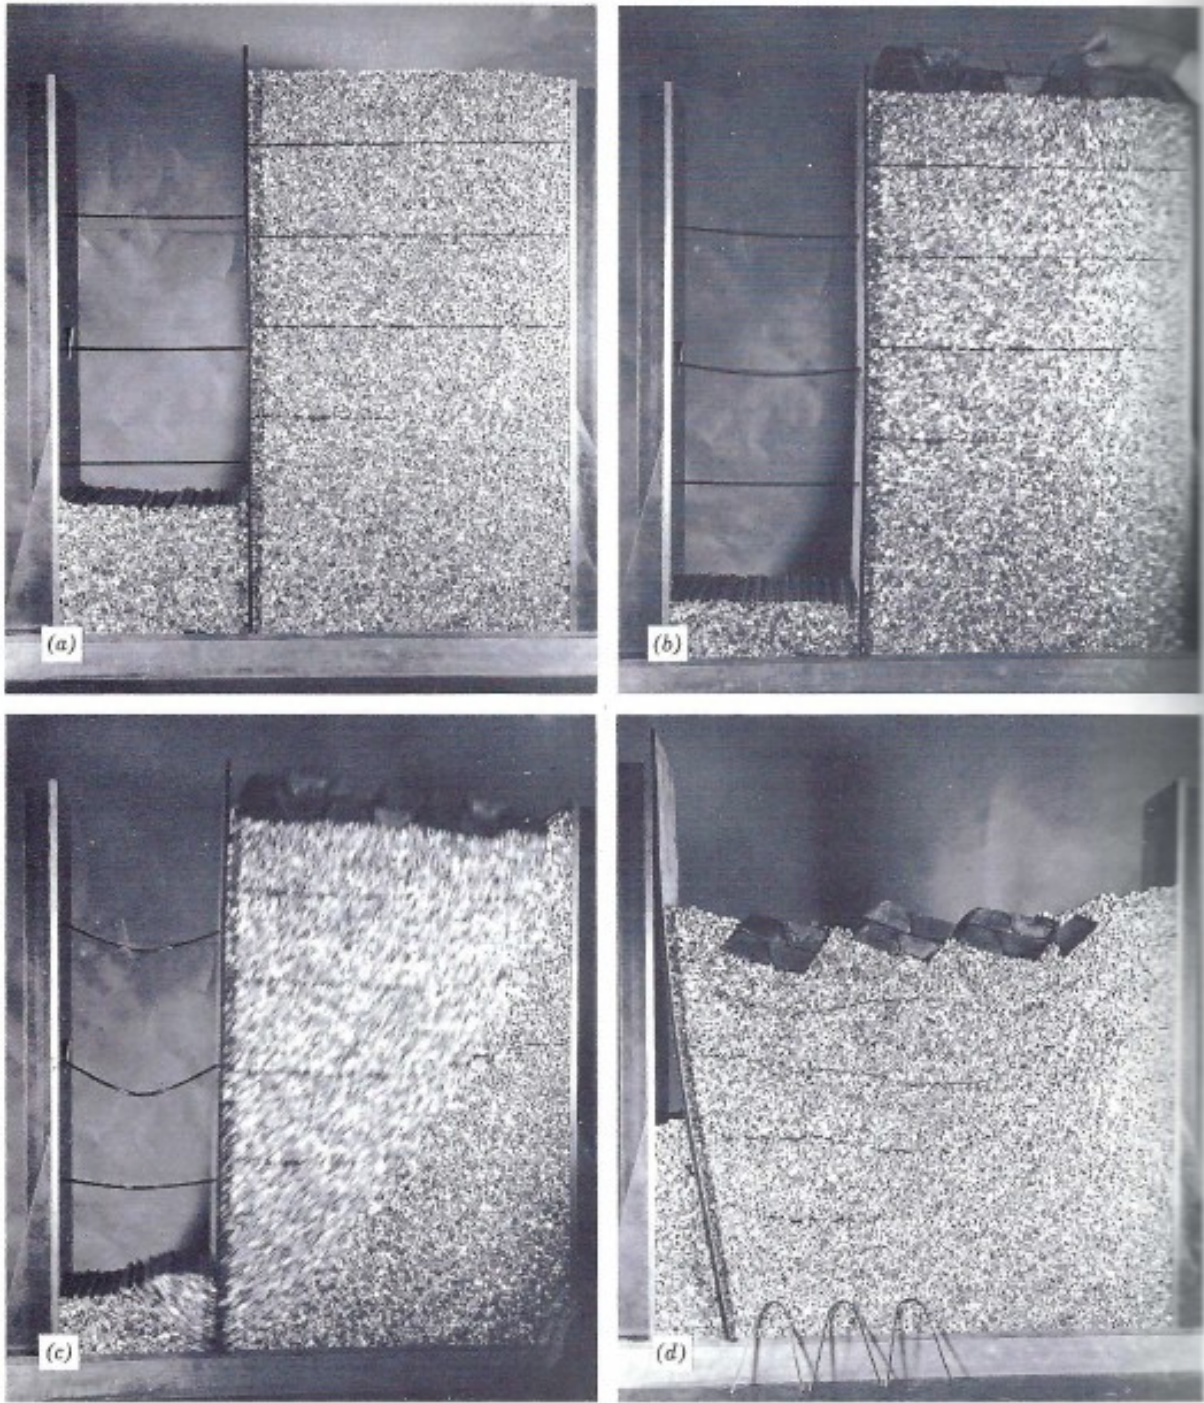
Failure of model of braced excavation. (a) Stable. (b) About to fail. (c) Failing; note motions. (d) After failure.
